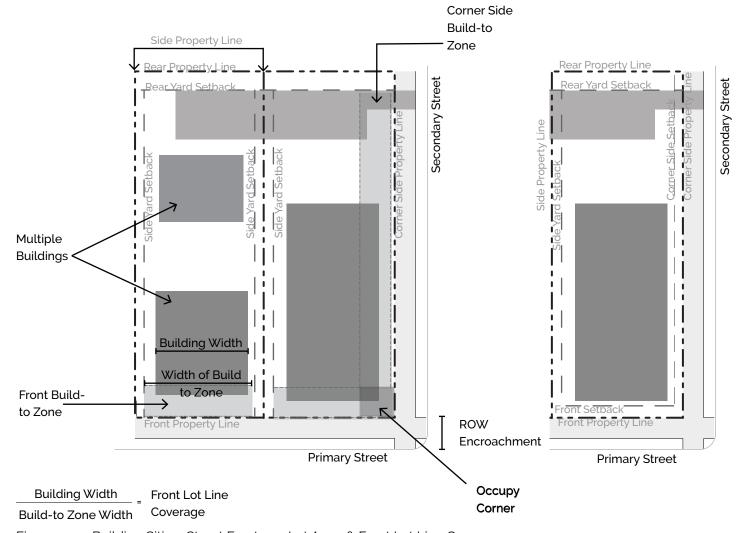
Building Siting: Street Frontage, Lot Area & Front Lot Line Coverage.
